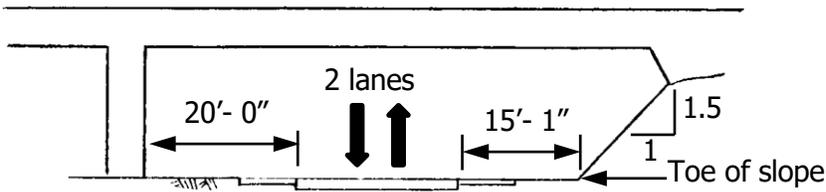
Bridge elevation view of horizontal clearances for a 2-lane highway feature with 2-way traffic below the bridge.
